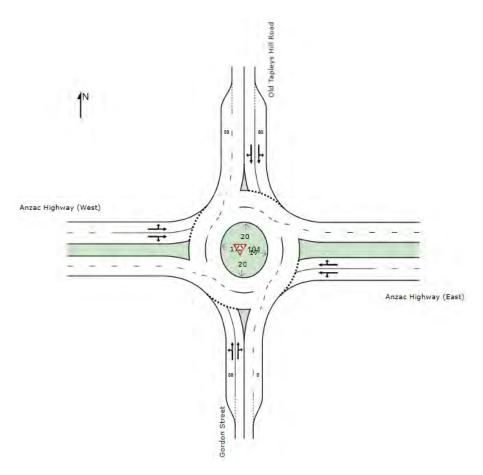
Anzac Highway, Gordon Street and Old Tapleys Hills Road Junction Layout - All Options
